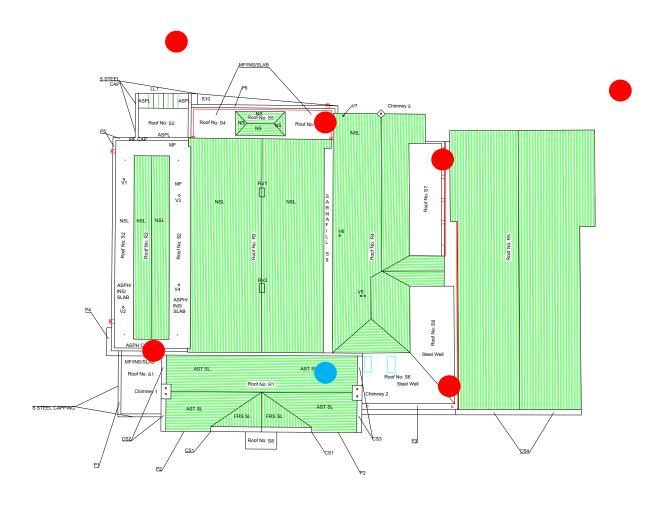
Roof plan showing proposed location of surveyors ( ) and remote monitoring ( ) for phase 2 ecology surveys.
